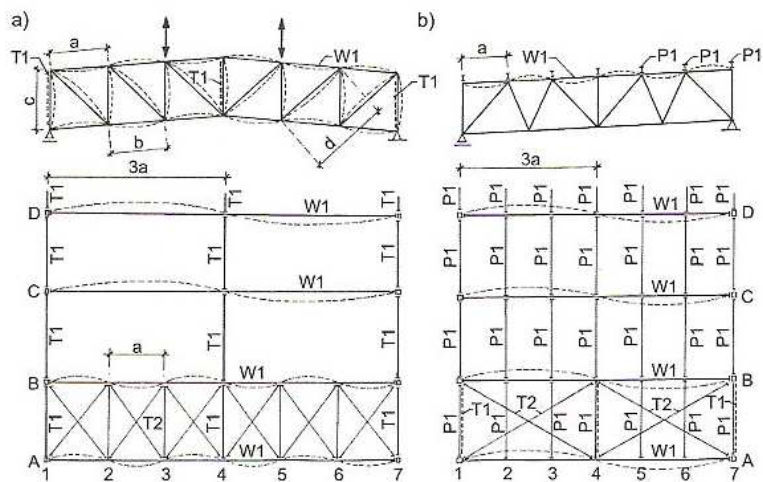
Examples of two-slope truss rafters: 1- glazing
